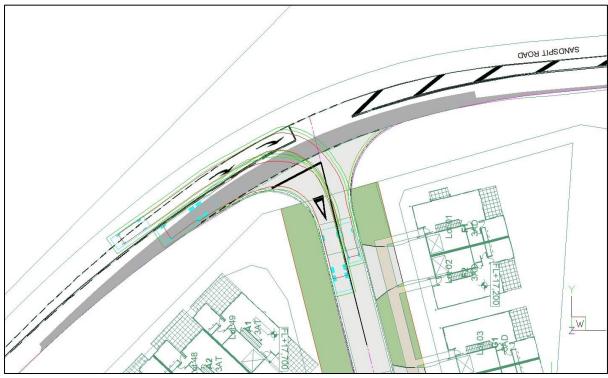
Sandspit Road Intersection - 10.3 metre Truck (Left Out) & 6.3 metre Van (Right In)
